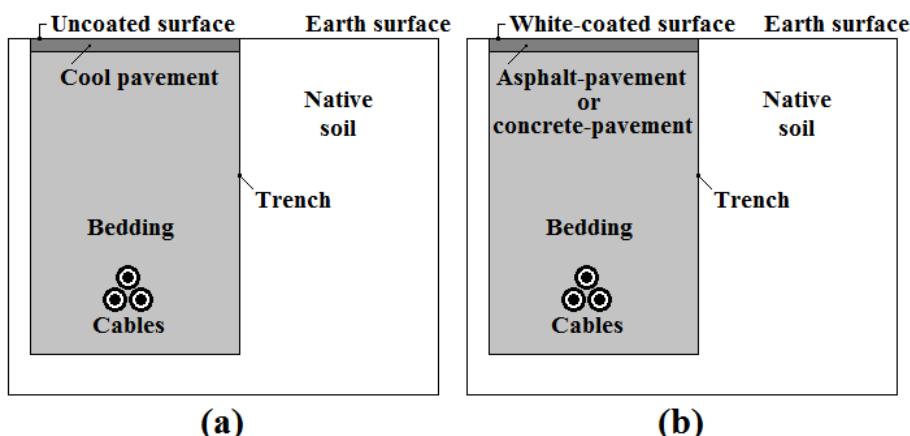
New methods for increasing the ampacity of underground power cables: (a) cool pavement with uncoated surface, and (b) asphalt- or concrete-pavement with white-coated surface.
